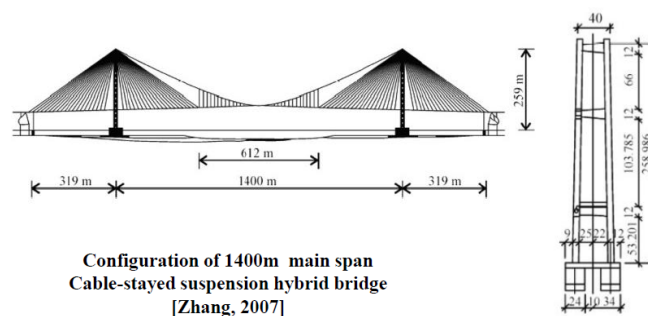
Lingding Strait Bridge (China) Bridge^[1]
